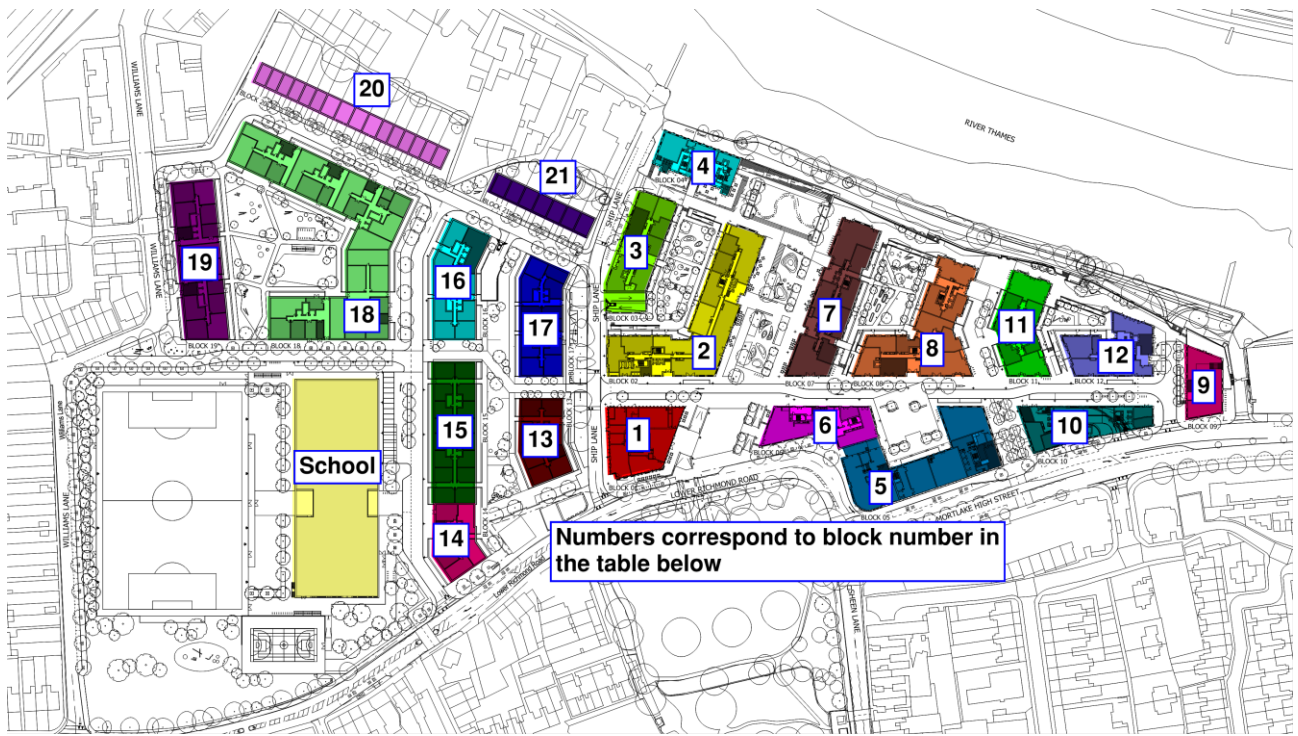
Proposed Stag Brewery Site Numbering Plan.
